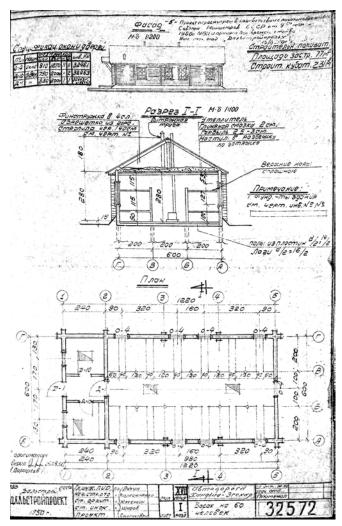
Outer view, cross-section and floor plan of a barracks for 60 prisoners on the construction site of the highway Khandyga-Ege-Khay in Yakutia (picture Vadim Gritsenko).
